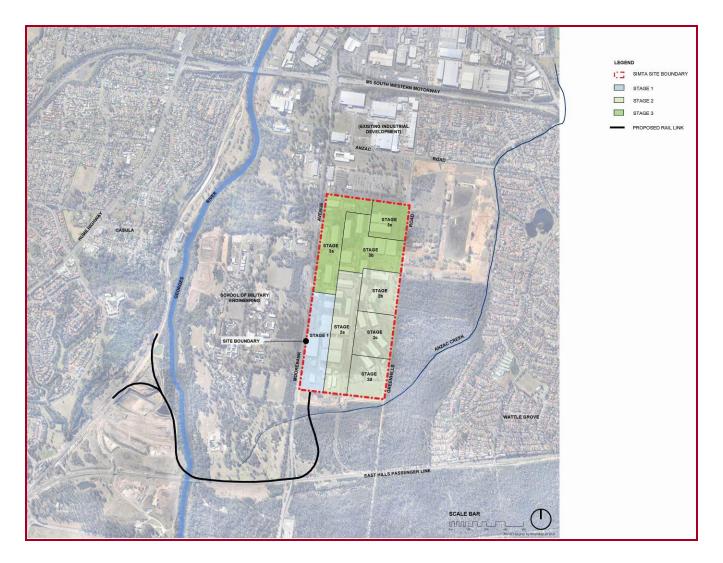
SIMTA Concept Plan and Proposed Development Stages.
